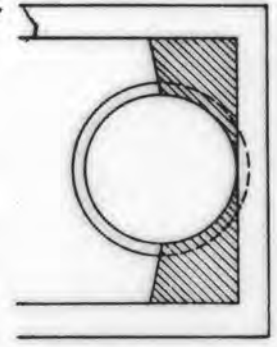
DETAIL OF BOTTOM CONSTRUCTION WHEN INLET SERVES AS MANHOLE
